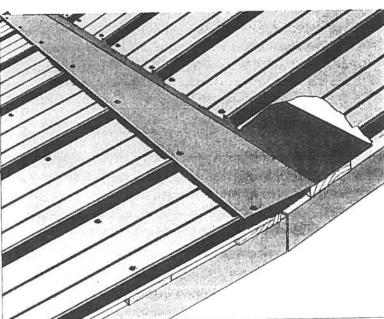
The transition flashing provides a continuous drainage where two slopes meet.
